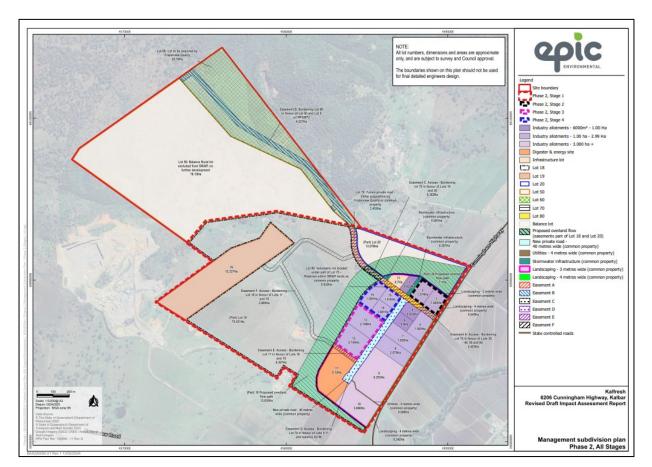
Excerpt from Phase 2 Subdivision Proposal Plan (Stages 1-4)
